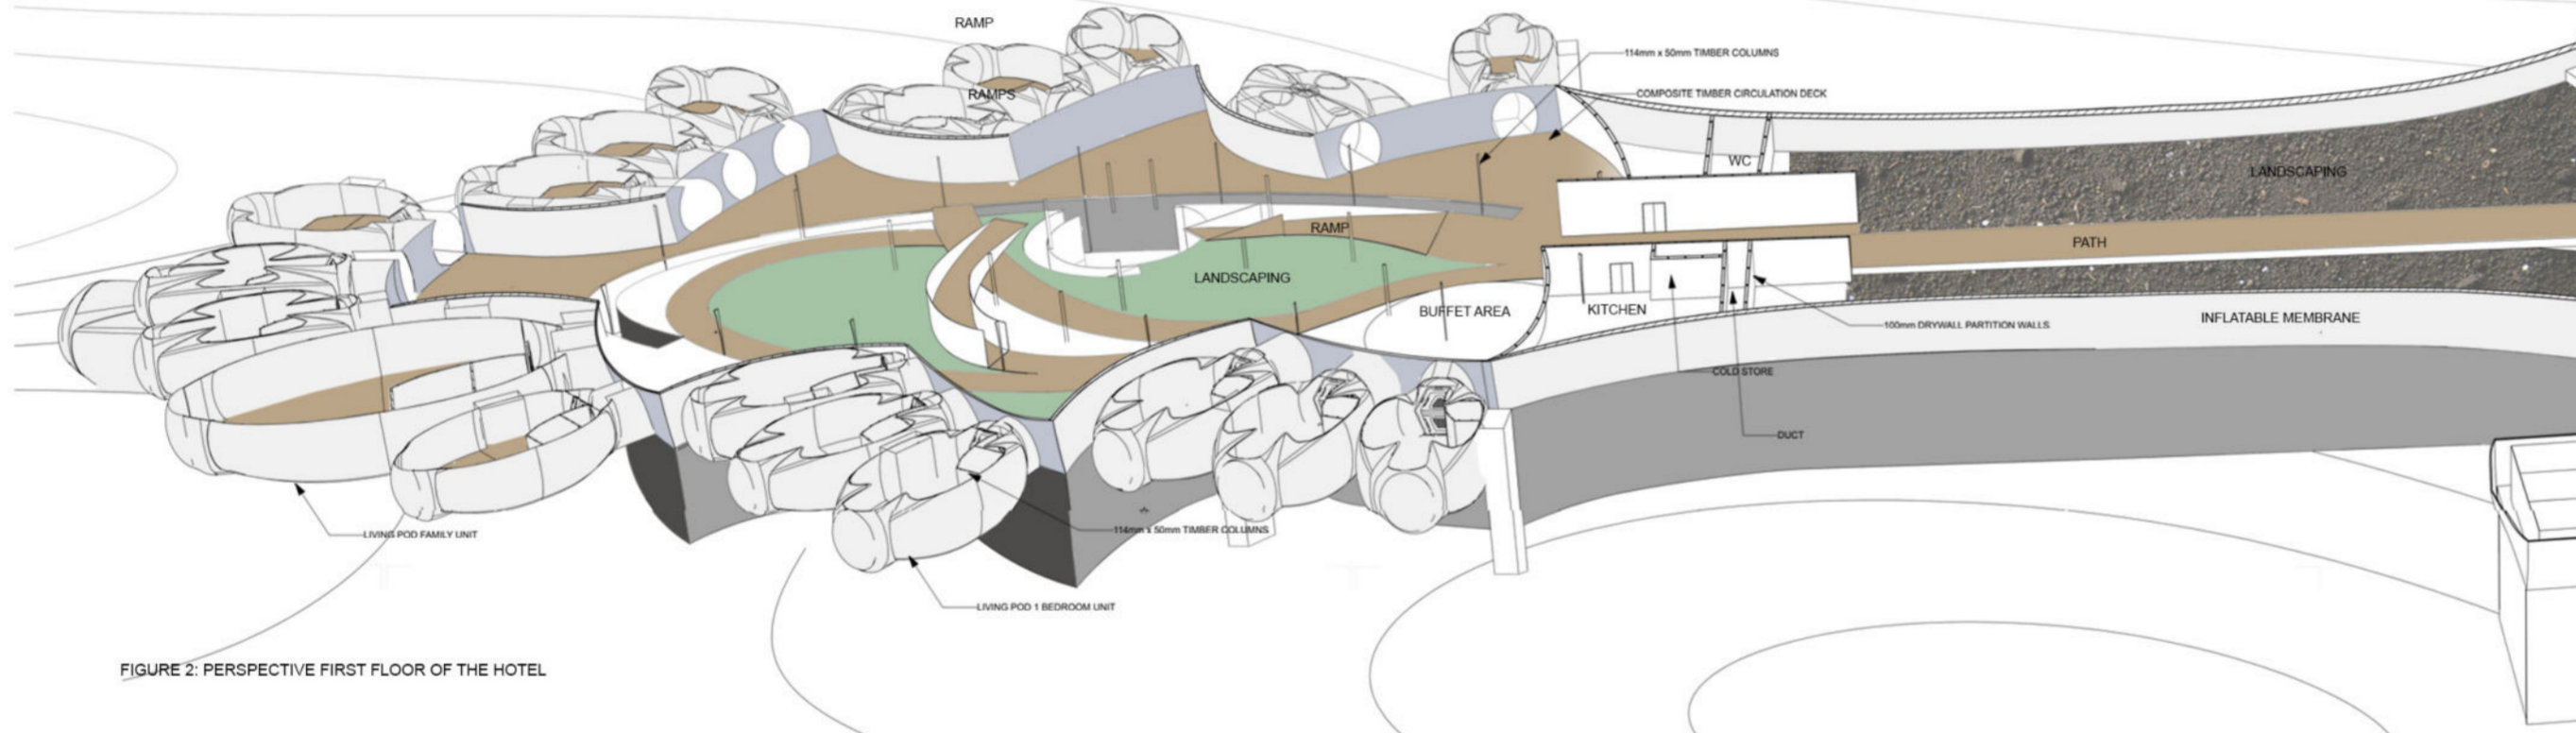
PERSPECTIVE FIRST FLOOR OF THE HOTEL
